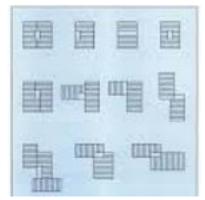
Plan view of possible locations of vertical cores with respect to load
